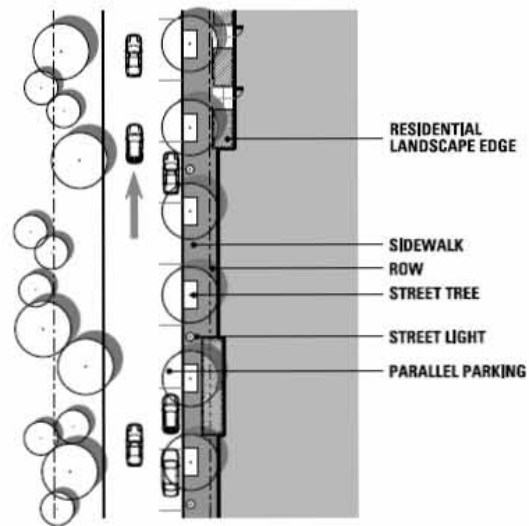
(Page 11 of 18) Streetscape Plan
